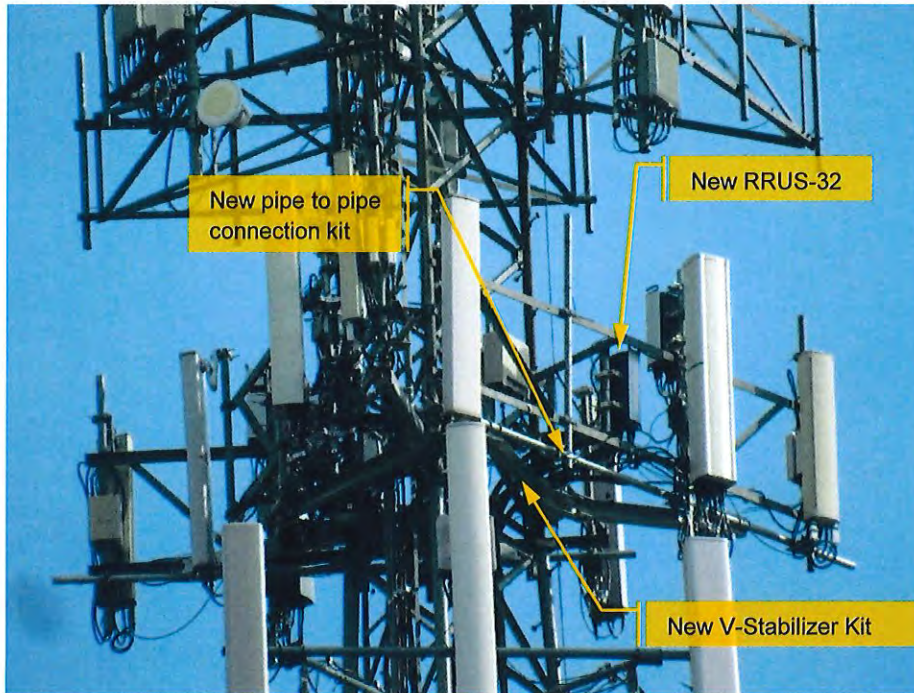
Existing mount at 162-ft, showing new RRUS, new V-Stabilizer kit and new pipe to pipe connection kits
